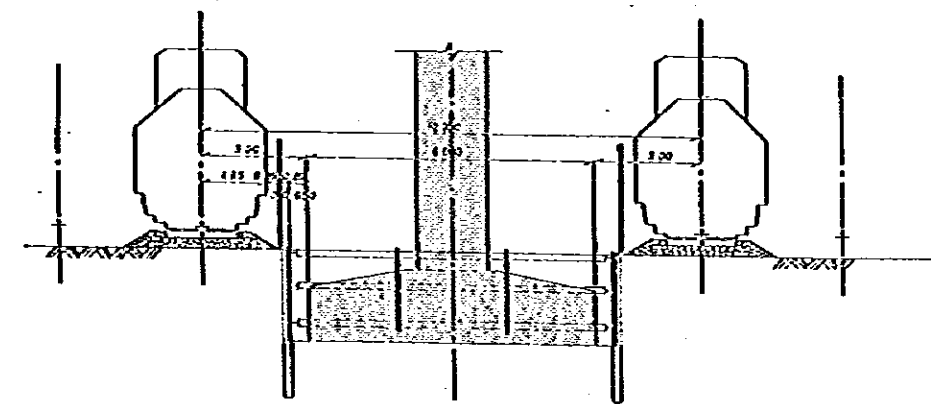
Minimum Clearance Between Track Centers at Bridge Pier Construction Work
